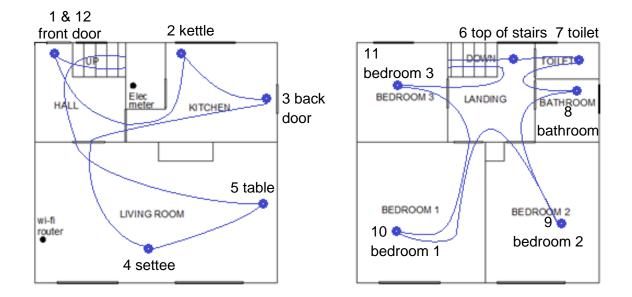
The walk-through route and 12 pause points at Home1, ground floor (left) and first floor (right)
